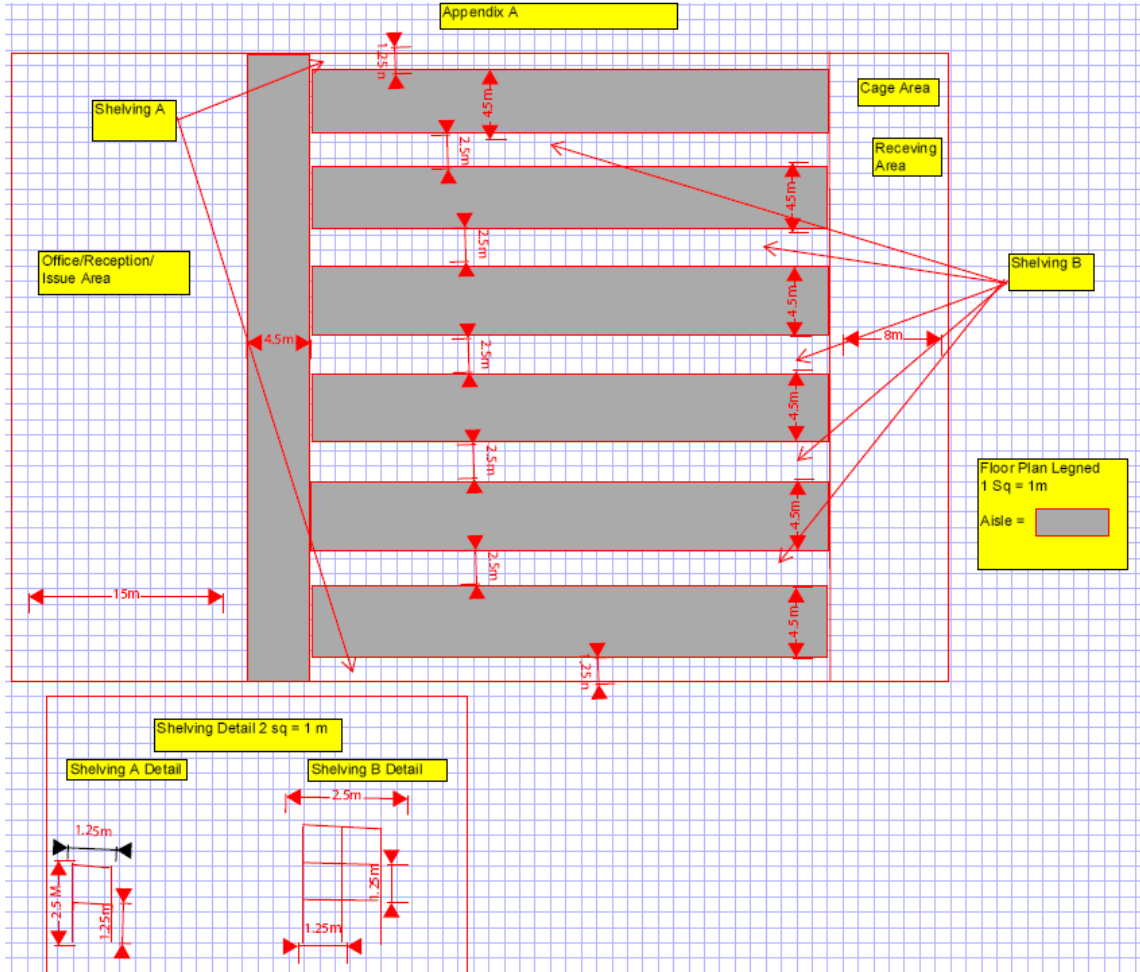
Schematic of pallet rack configuration and layout (Courtesy of USACE)
